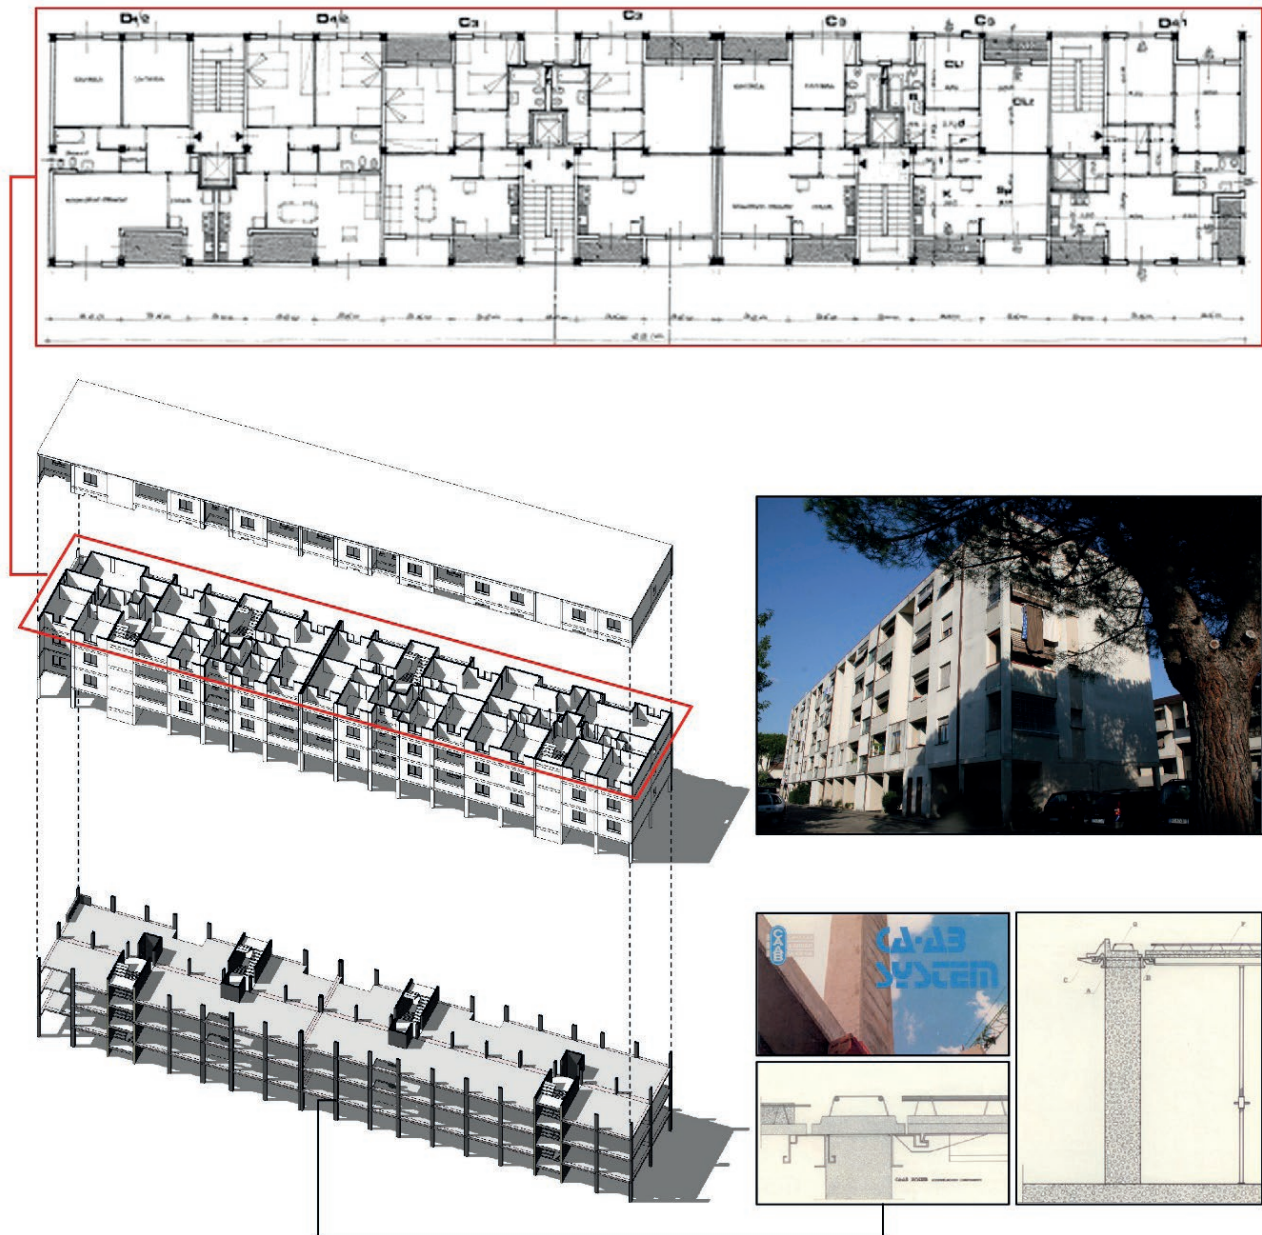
Case study building. Type floor plan, photographic evidence, patent details. © 2025, Authors.
